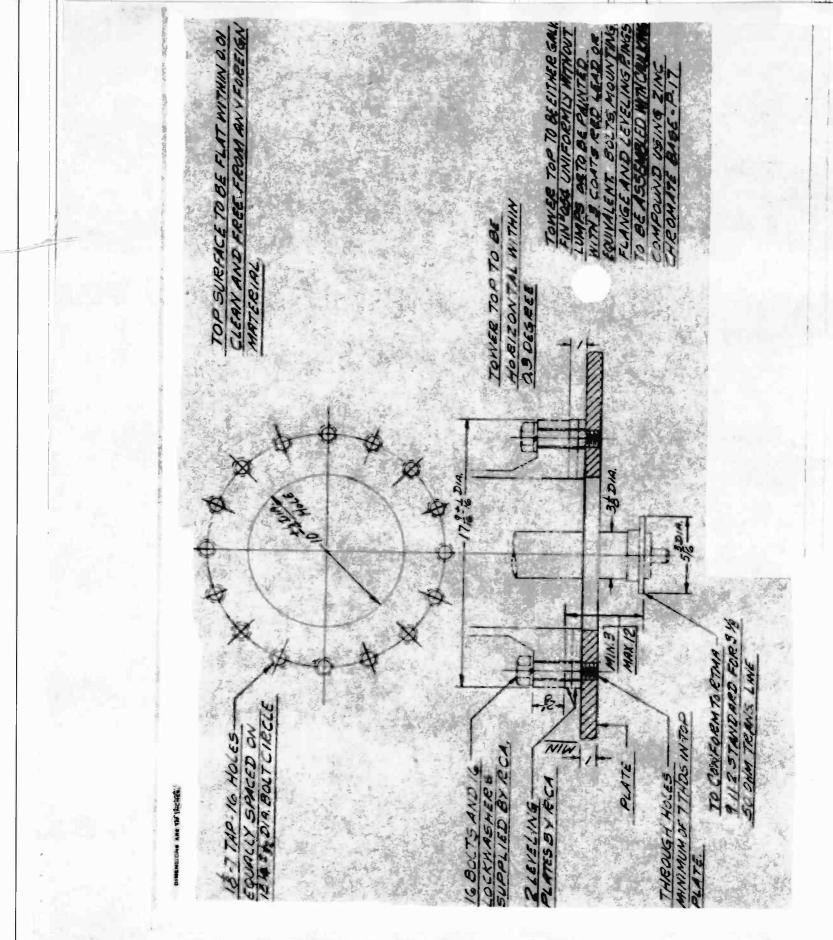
Mounting details, TFU-21BL and TFU-24BL Antennas (466357)
